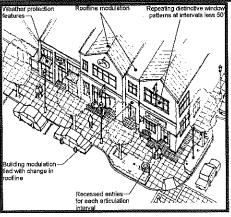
These buildings illustrate a combination of horizontal building modulation, roofline modulation, and building articulation to reduce the architectural scale and provide visual interest.
